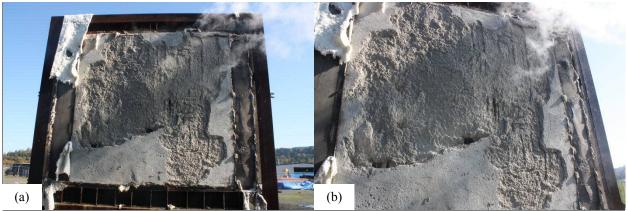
Assembly follow test showing (a) exposed face and (b) closer view.
